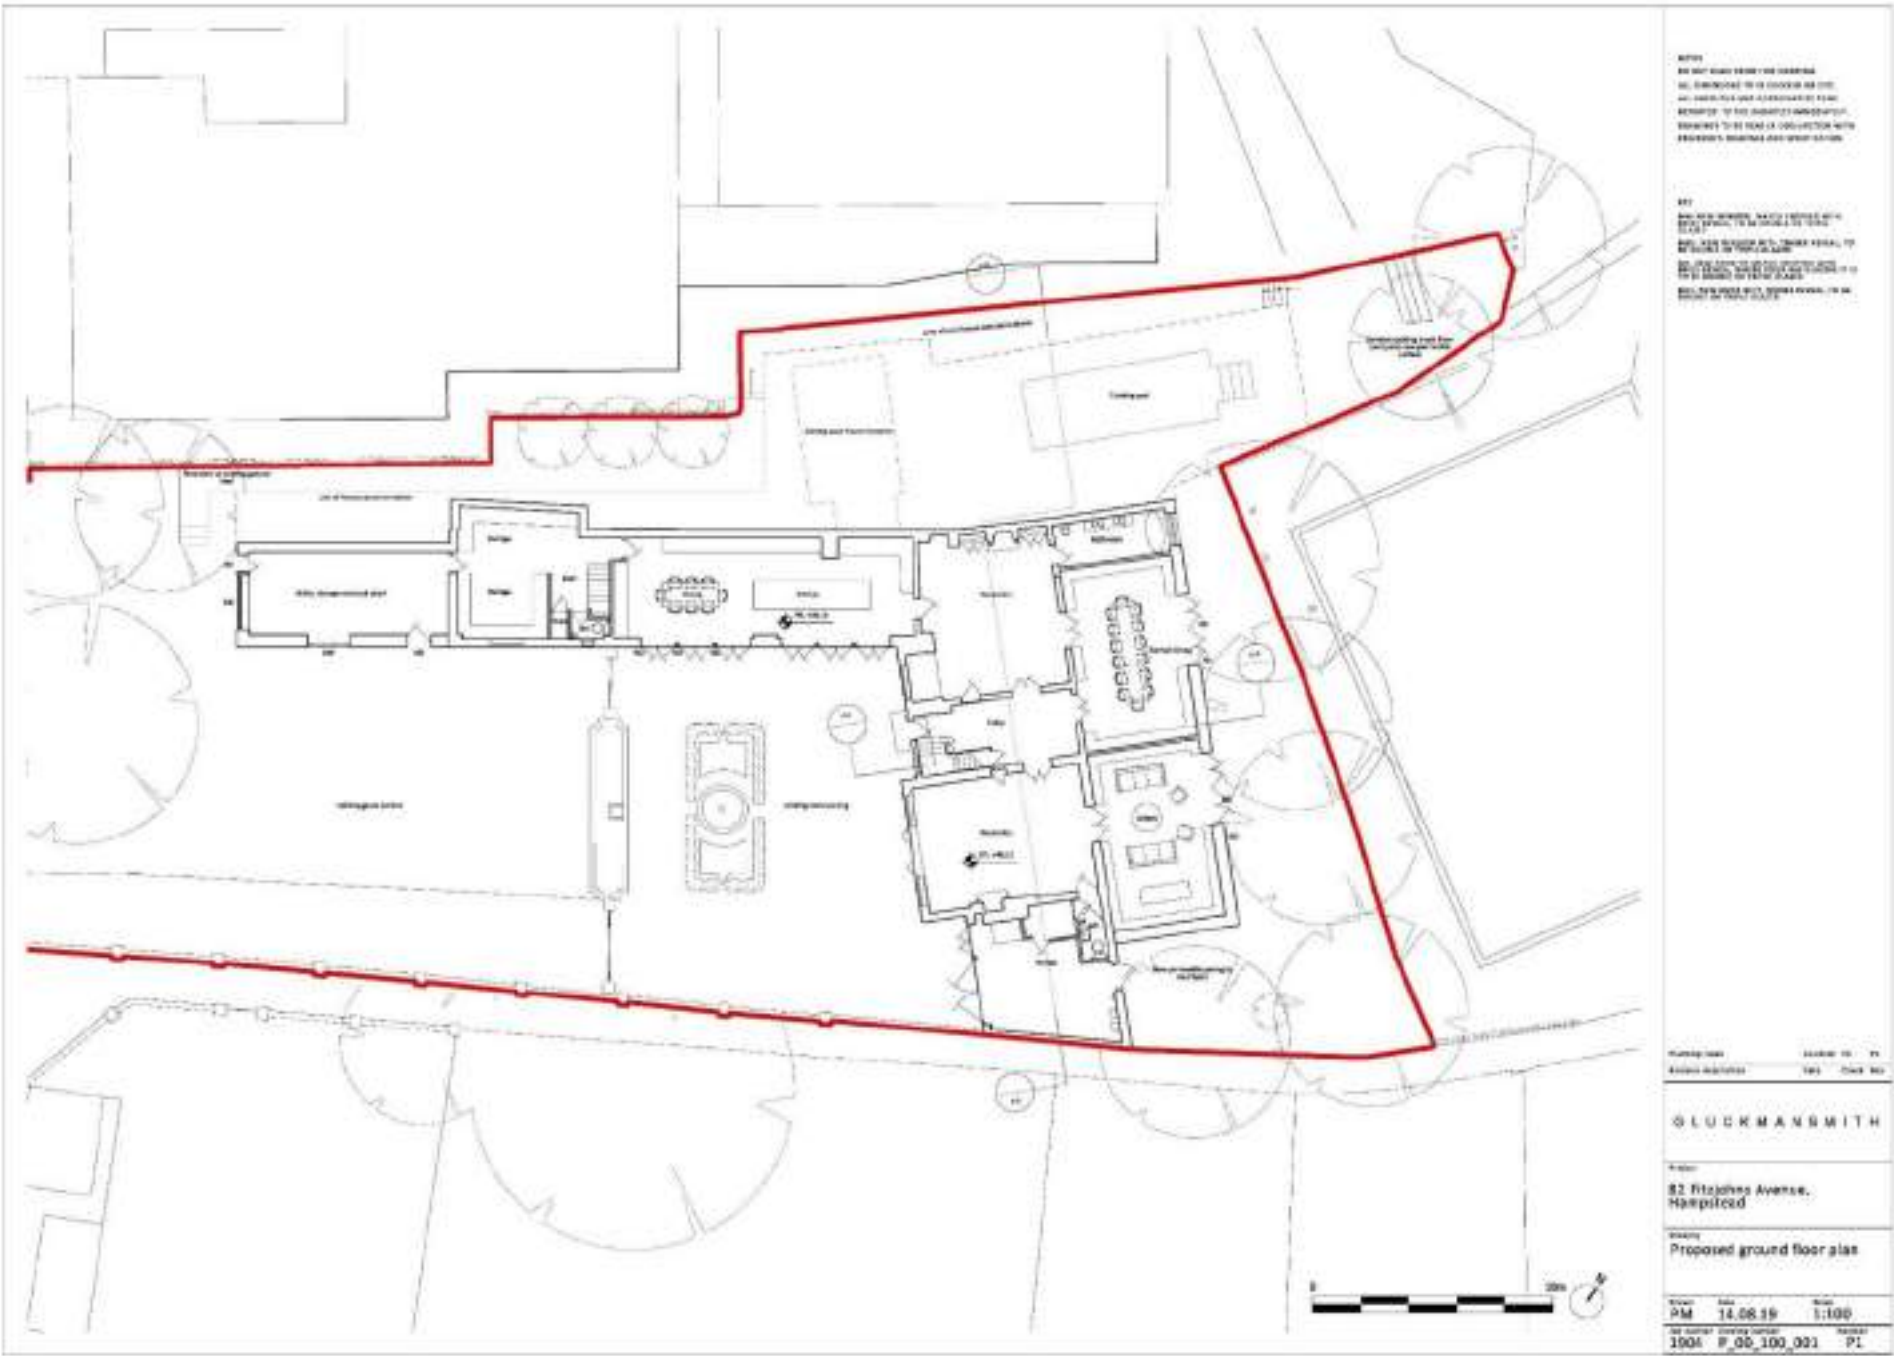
Proposed Ground Floor Plan, GluckmanSmith Architects
